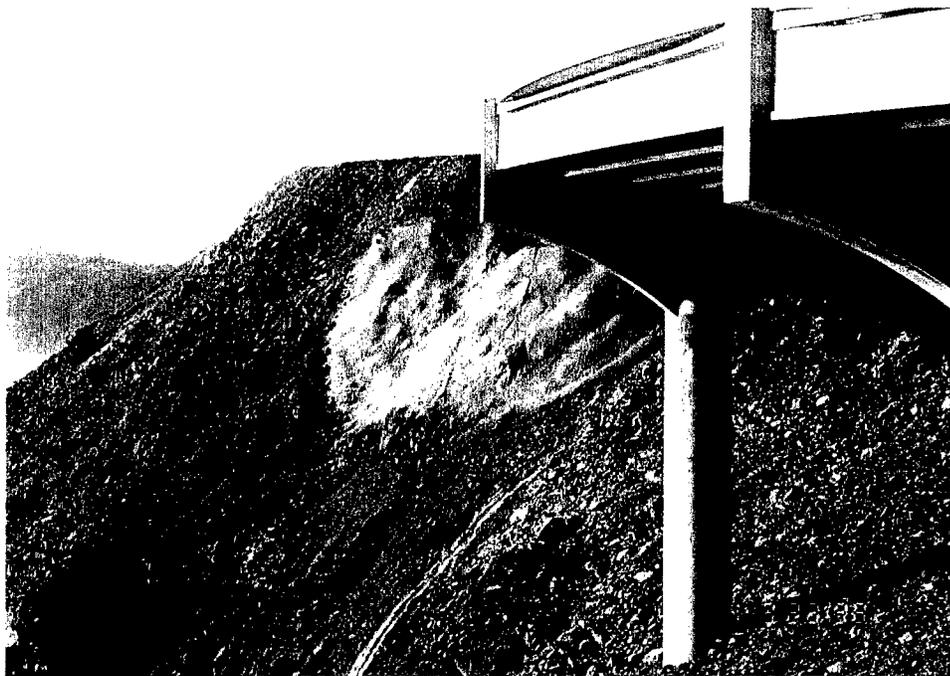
Untreated Control Section at North End of the Bridge in 1998.
